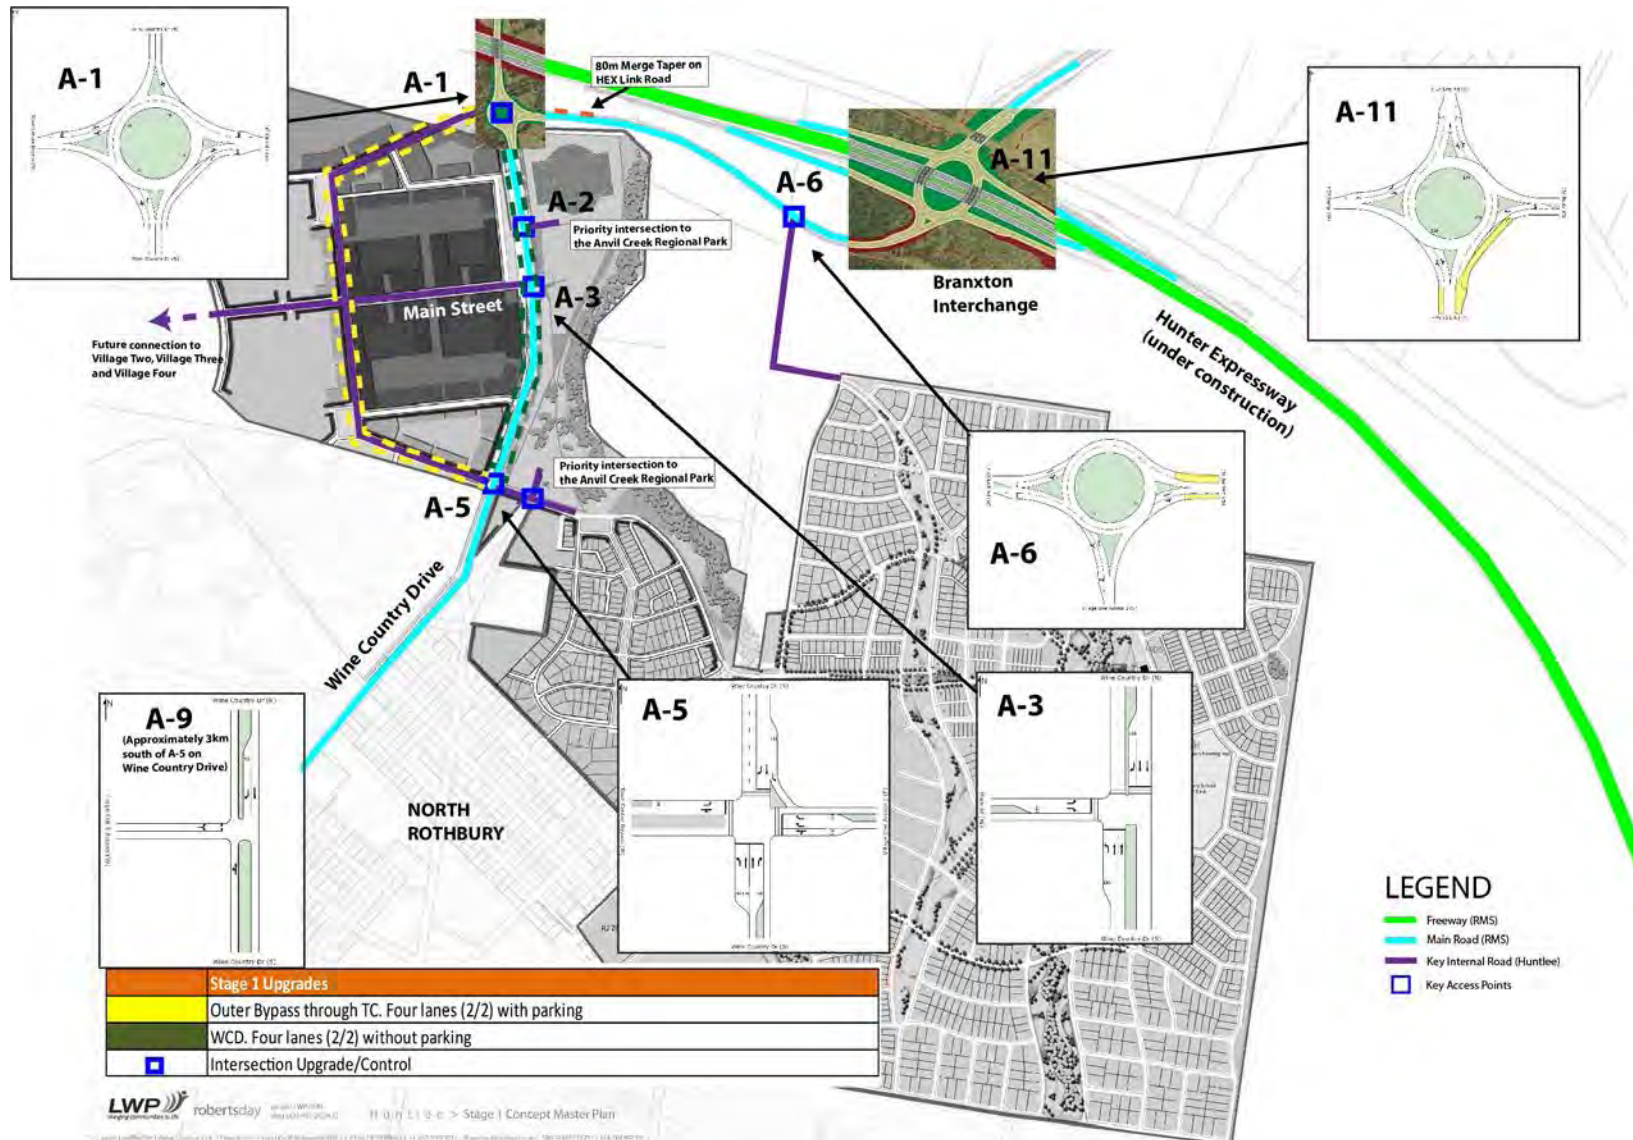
Proposed Road and Intersection Upgrade (Stage 1)
